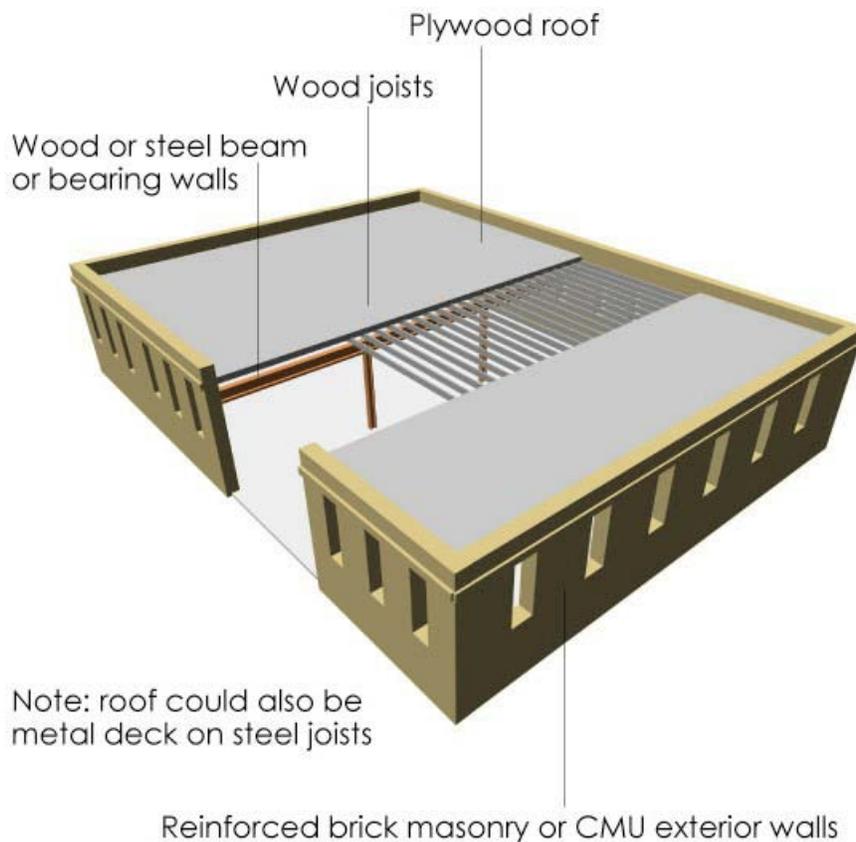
Building Type RM1t: Reinforced Masonry Bearing Walls
